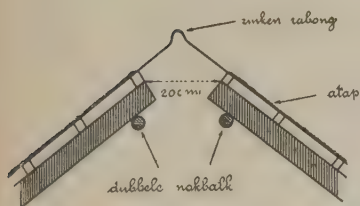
Showing simple construction with double roof-trees (for zinc, "sirap" or "atap" roofing).
